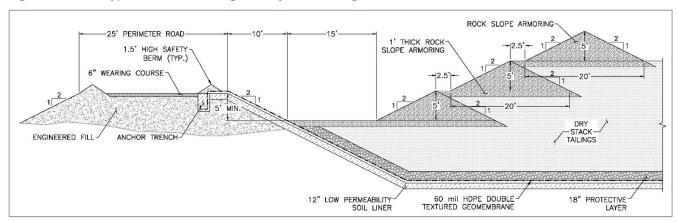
Typical rock armouring and dry stack tailings section 3
